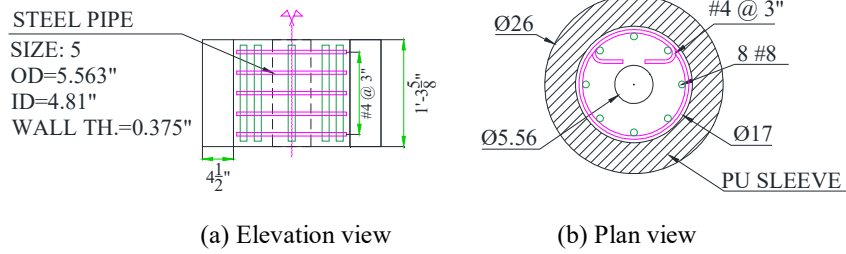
Bi-layered PU segment: geometry and reinforcement details.
